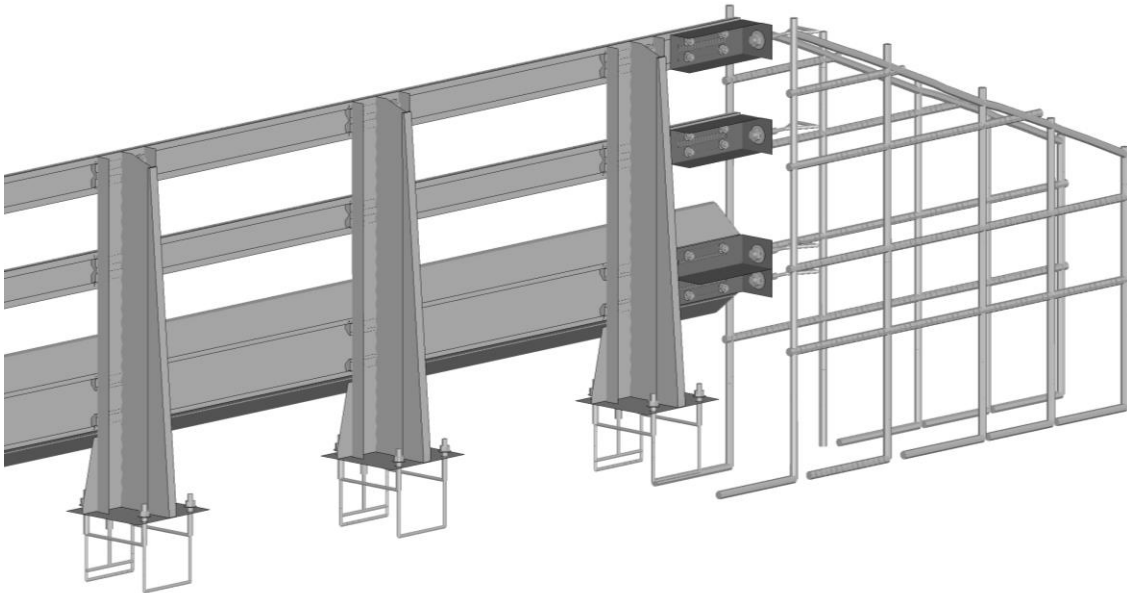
Steel reinforcement bars in the end parapet of the 3BMR.
